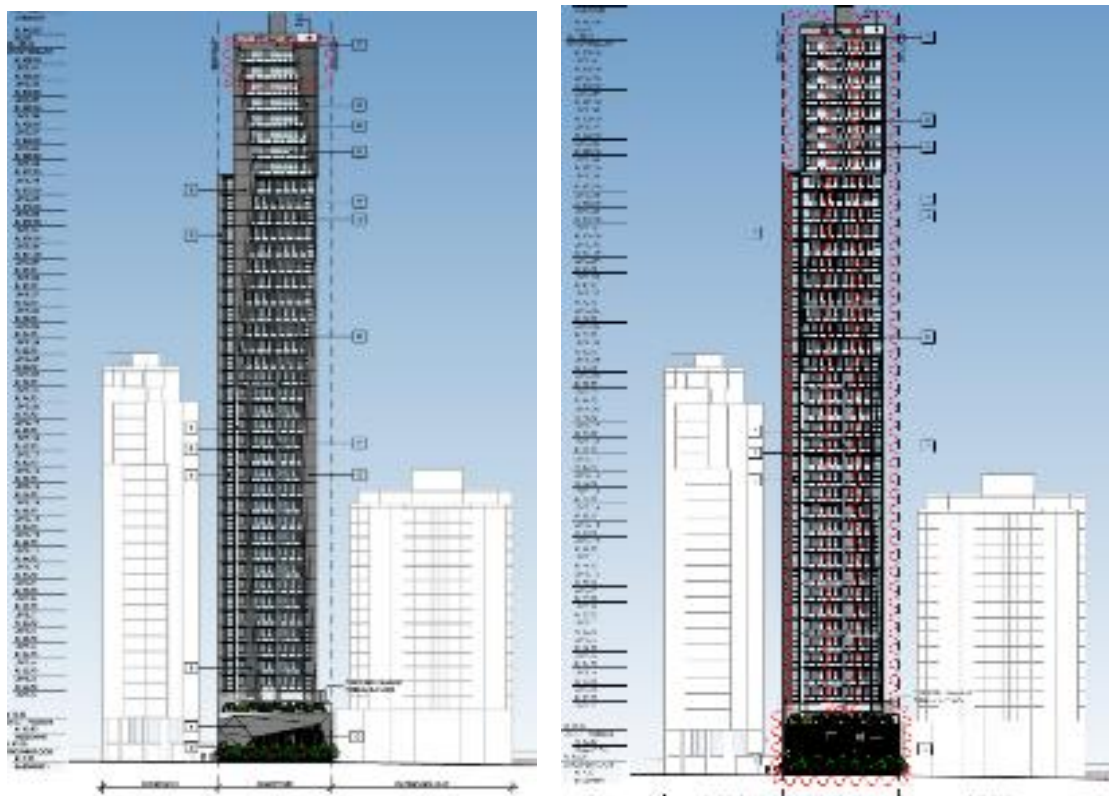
Approved (left) and proposed (right) southern elevation from Parkes Street.
